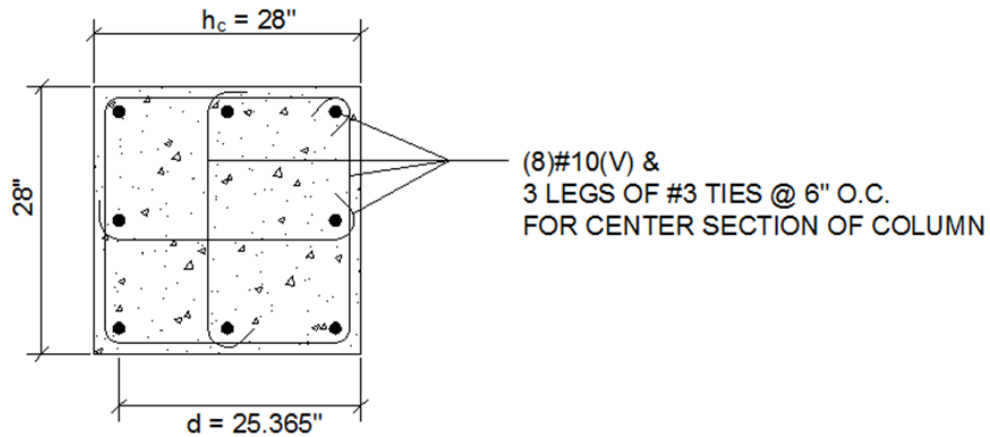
Existing exterior MRF column cross-section at center of column at ground floor level based on SDC D design.
